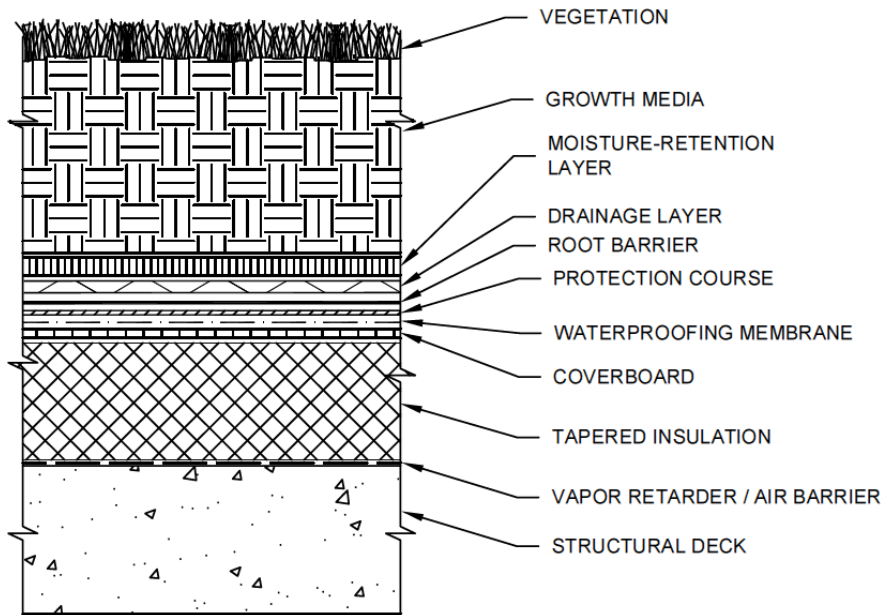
Conventional roof assembly adapted to a vegetative roof system
